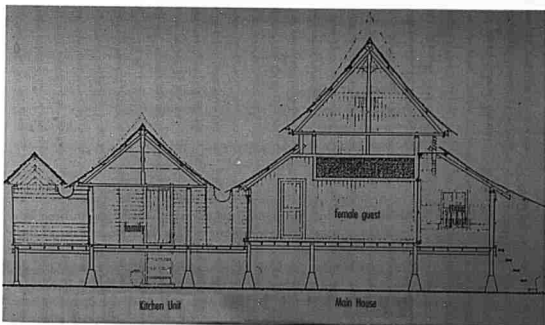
Plan of a peninsular Malay house at Beranang, Selangor.
